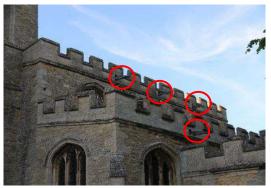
South aisle showing rainspouts from the nave roof and south aisle roof (highlighted).
